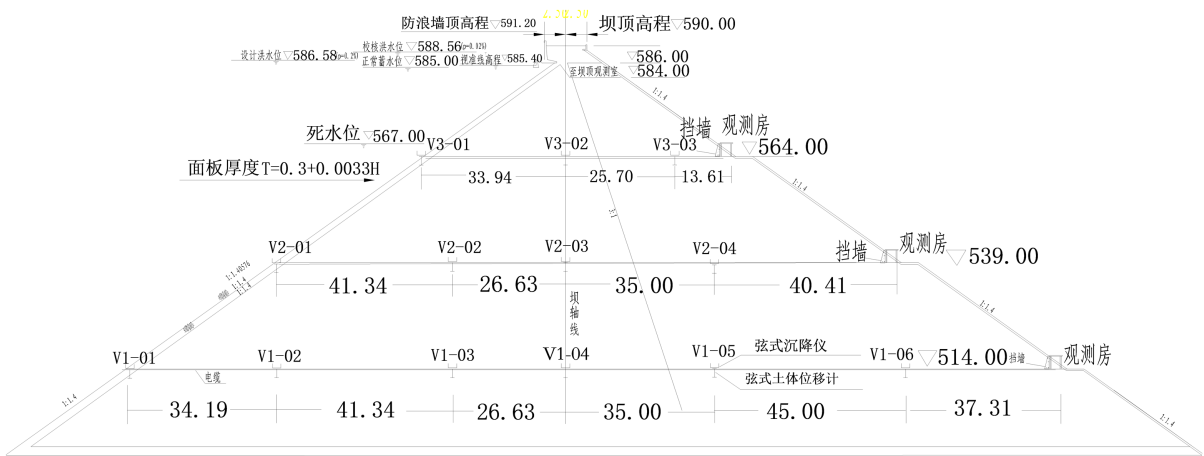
Layout of chord sinking apparatus inside the dam (unit: m)
